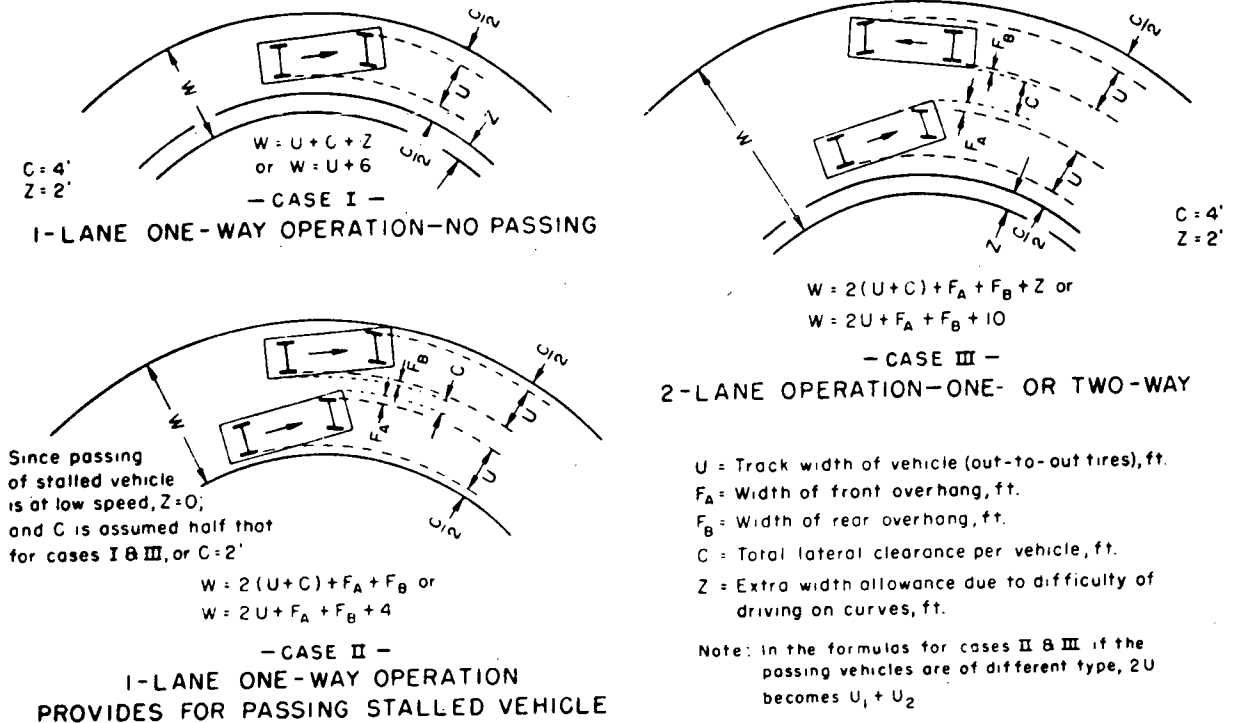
Pavement widths on curves at intersections: basis of derivation. Source: AASHO (102, p. 333).
